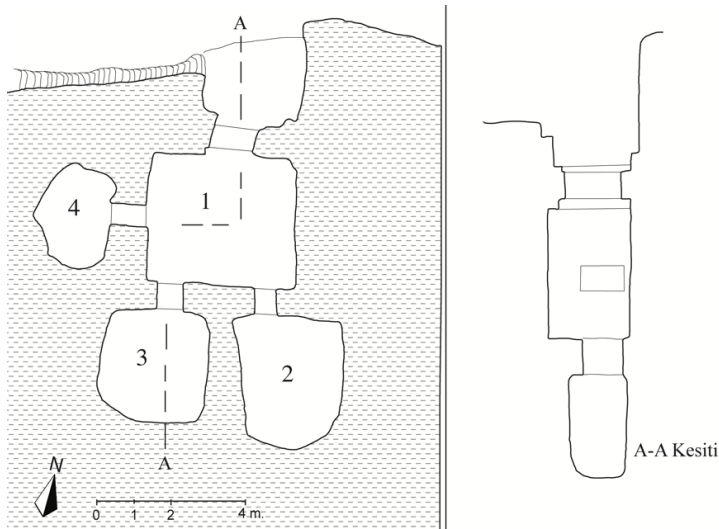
Architectural plan of Multi-roomed Rock-cut Tomb I.
